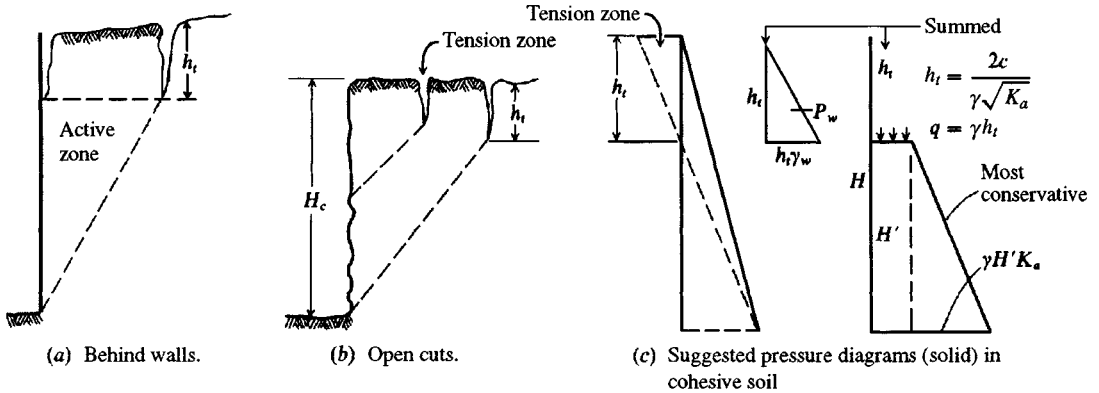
Tension crack and critical depth of an unbraced excavation. Tension cracks are often readily visible adjacent to excavations.
